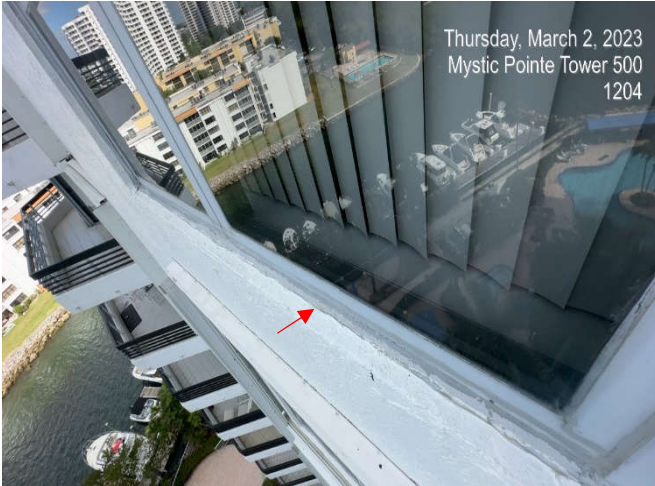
b.5 – Cracked and deteriorated stucco-to-metal caulking at window (Unit 723)
